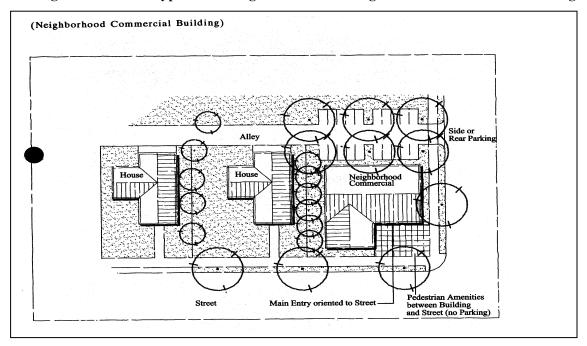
B – Typical Building Orientation – Neighborhood Commercial Building
